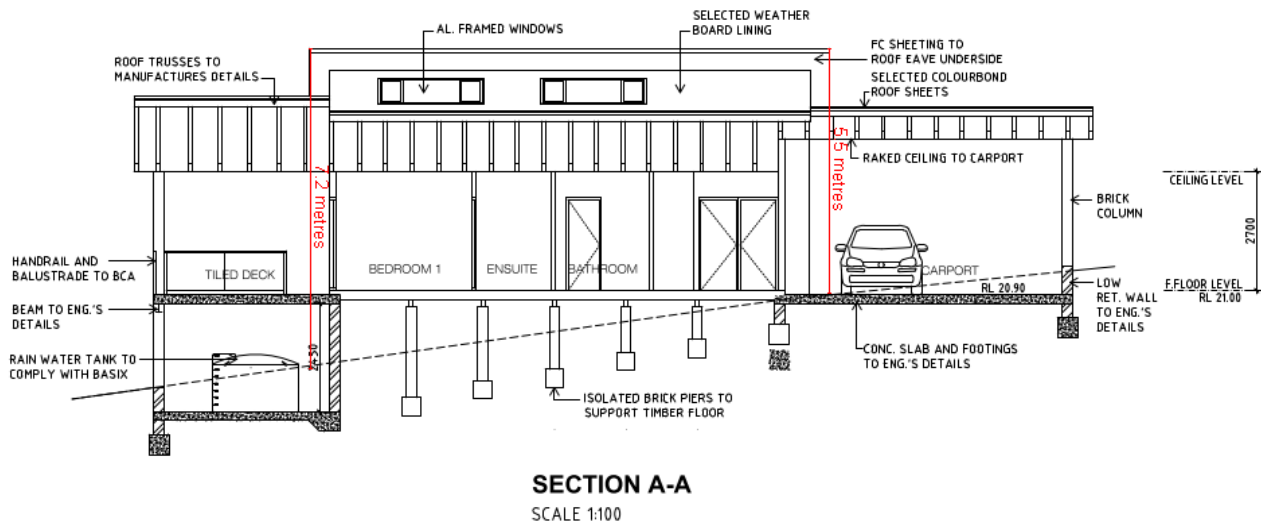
Extract of Section A-A (Drawing No. 2-2 1008 22, Issue 3, dated 6 February 2024) depicting building height.
